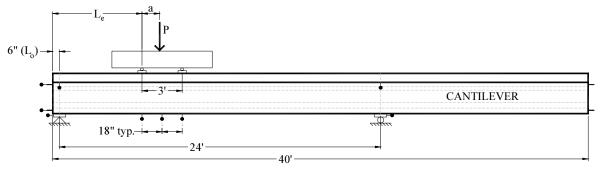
Spreader Beam, Rollers, and Loading Pads
